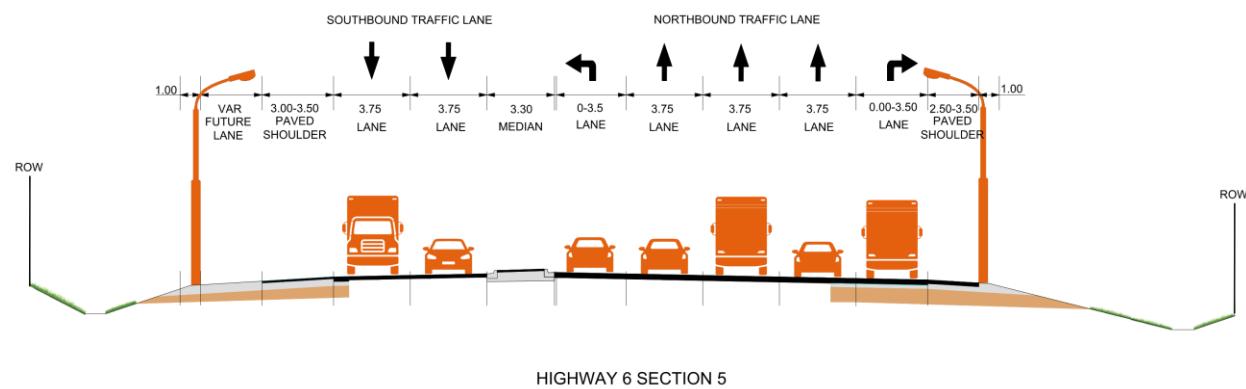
Highway 6 Typical Rock Cut Full Construction – From South of Mountain Brow Road to North of Mountain Brow Road
